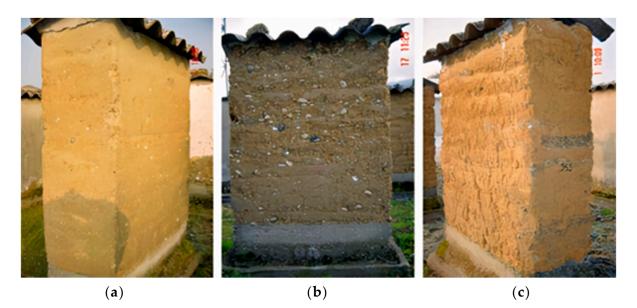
Rammed earth masonry units exposed to natural weather conditions for 20 Years [77]. (a) Wall made of earth containing 5% lime. (b) Wall made of unstable earth (mixed earth). (c) Wall made of unstable earth.
